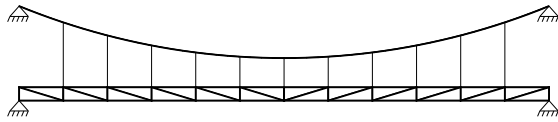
Suspension bridge stabilization by increasing of girder stiffness
